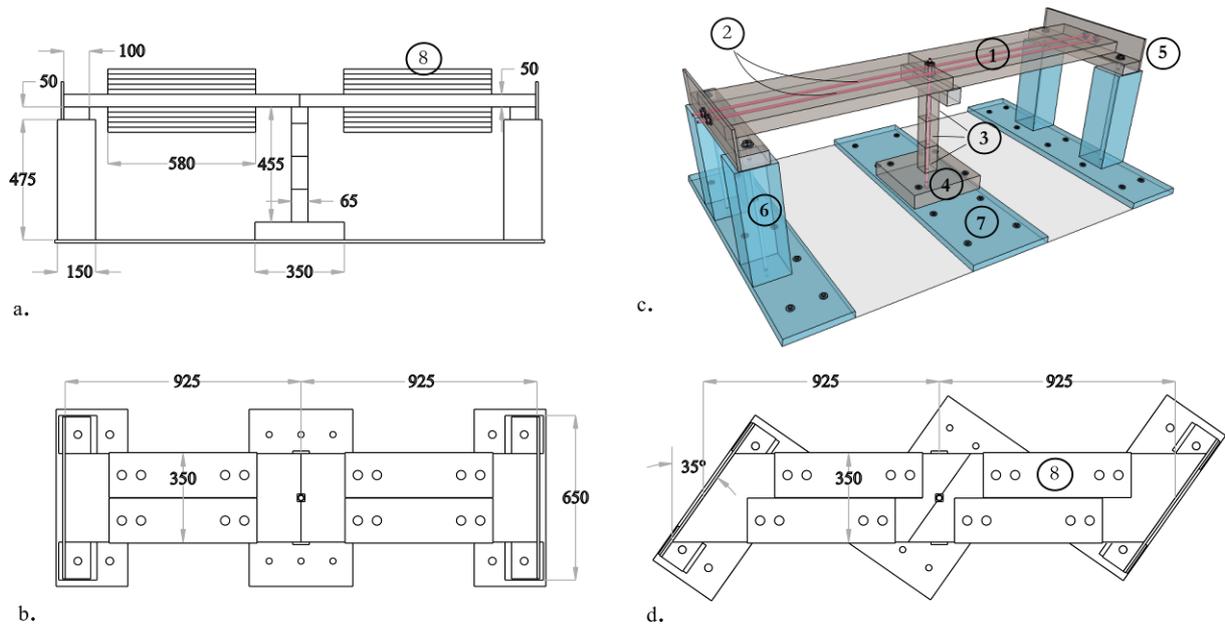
a) Elevation view of non-skew model; b) Plan view of non-skew model; c) Elements consisting the models 1) Decks, 2) Post-tensioning rods, 3) Pier blocks, 4) Foundation, 5) Abutments 6) Support columns (rigid), 7) Connection plates to shake table, 8) Extra weight plates; d) Plan view of skew model
